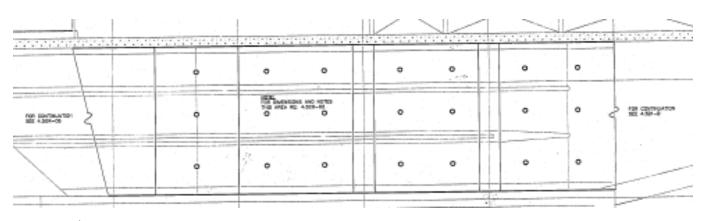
14th Street South Ramp Reflected Ceiling Plan – B1 Level
